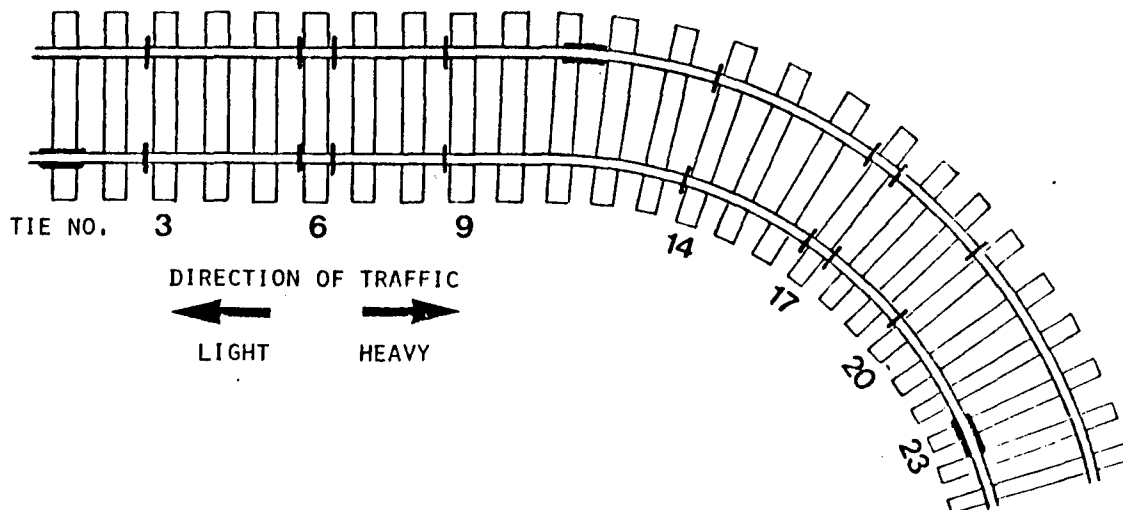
RAIL ANCHOR SPACING FOR 39'
